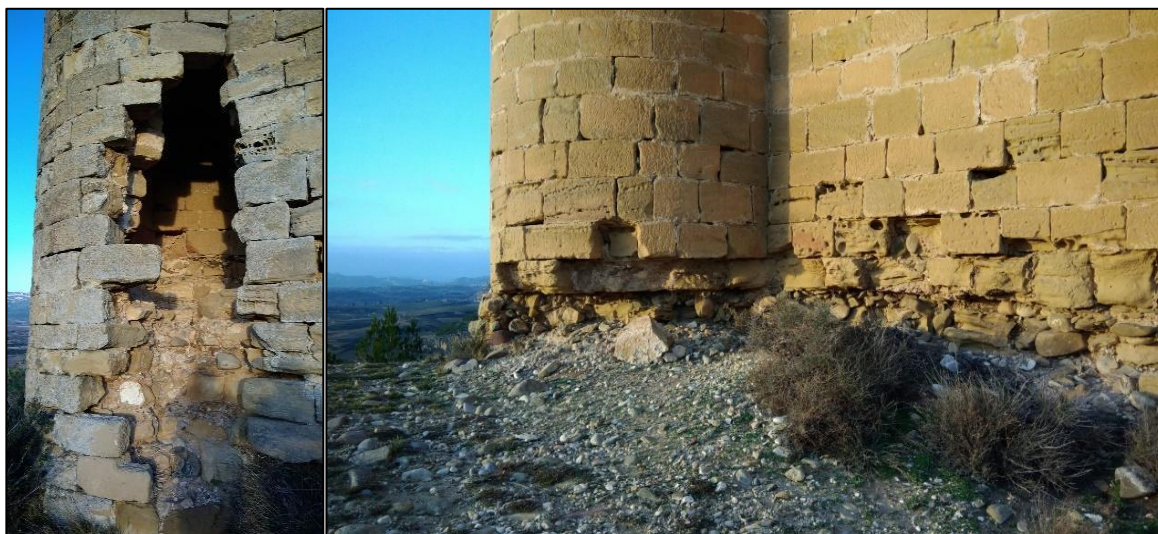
Tower of the castle outside and inside* (Photo credit: Authors).
